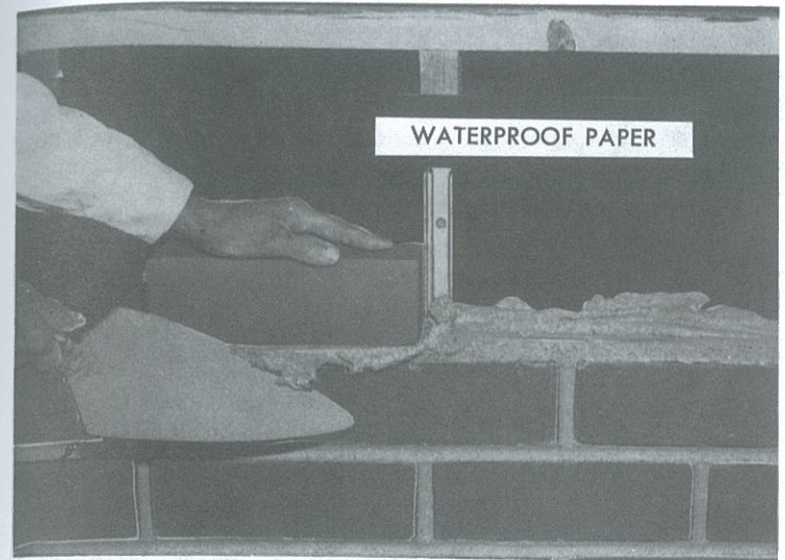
Placement of brick over anchor and horizontal joint reinforcement.
